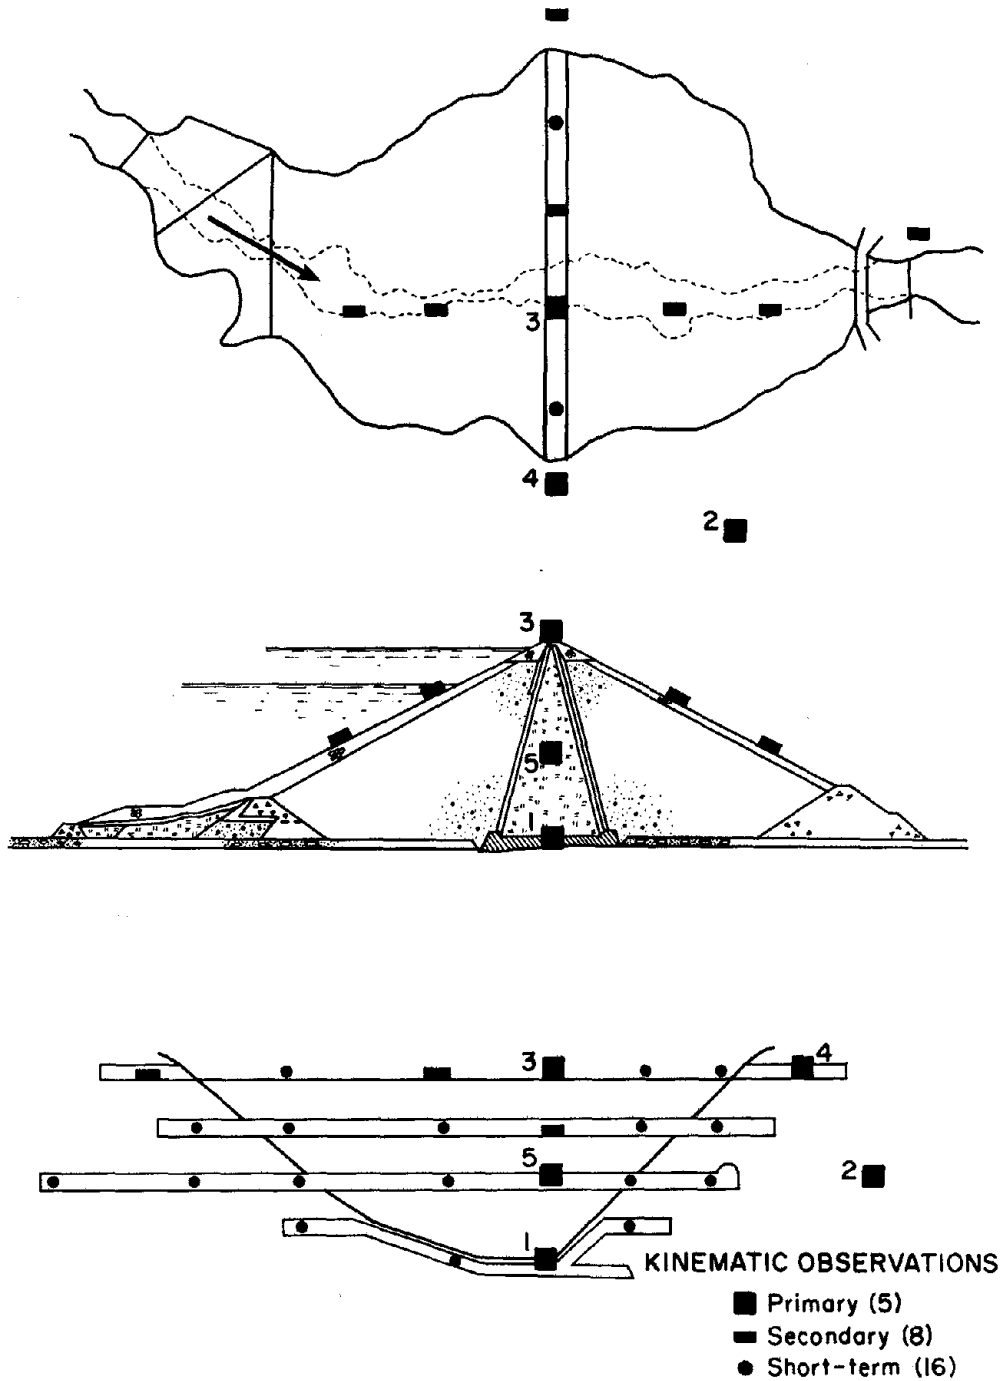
Plan view, transverse section and longitudinal section of Nurek Dam showing proposed system for measuring strong-motion.
